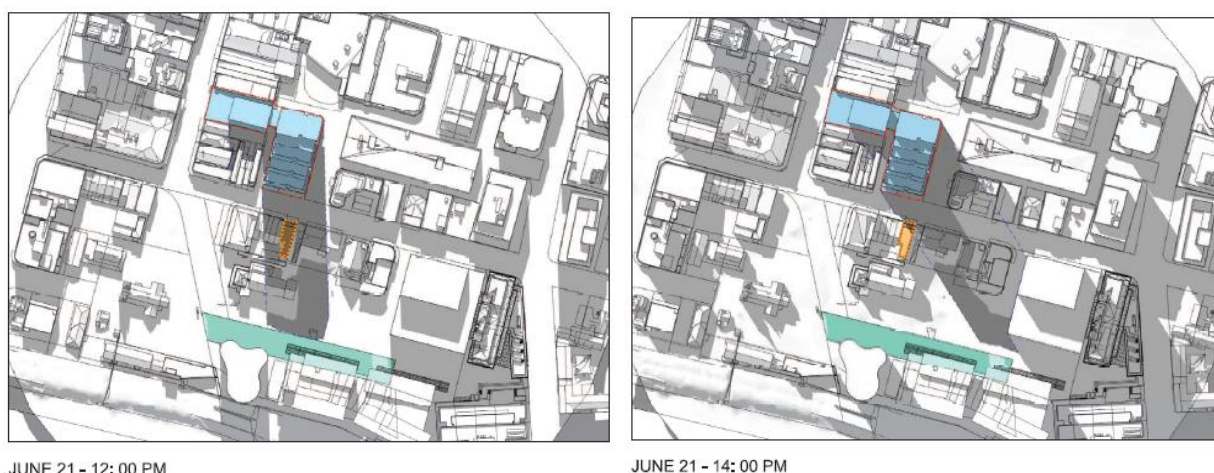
Shadow plans of proposed development between 12pm and 2pm midwinter (source: development application documentation). The development application shadow diagrams demonstrate that the protected area (shown green) will not be overshadowed by the proposed building (shown coloured blue) between 12pm and 2pm.
